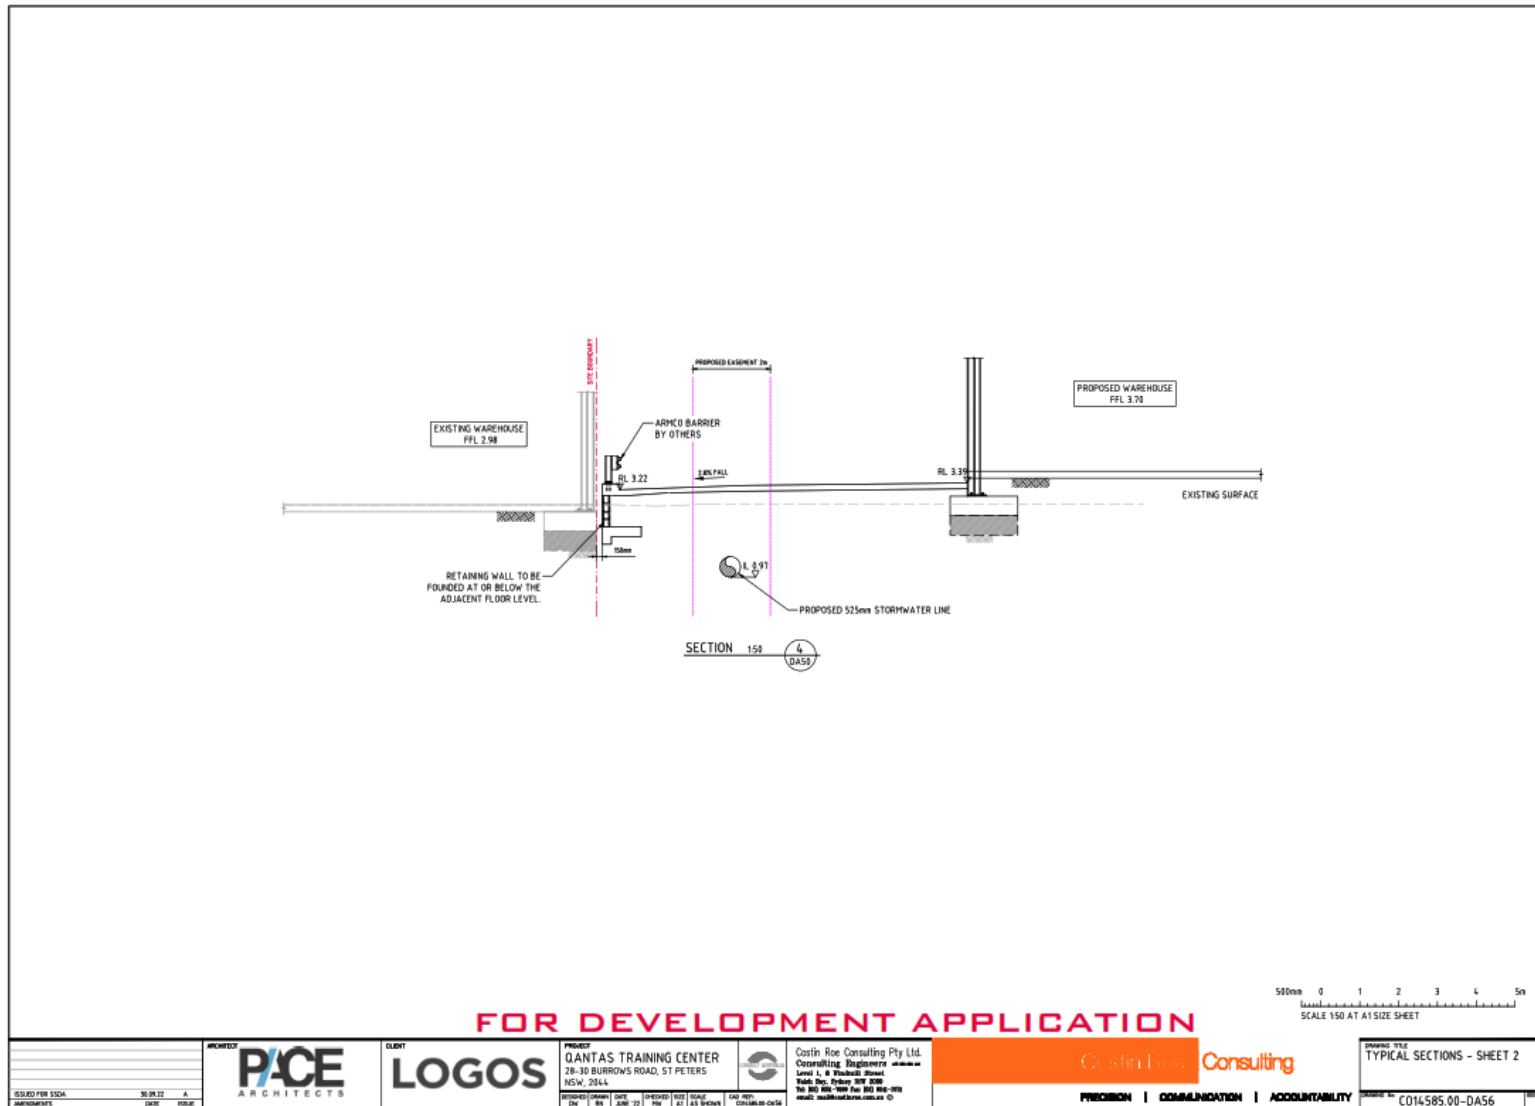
Typical section indicating level of new stormwater outlet (Source: LOGOS, 2022)
